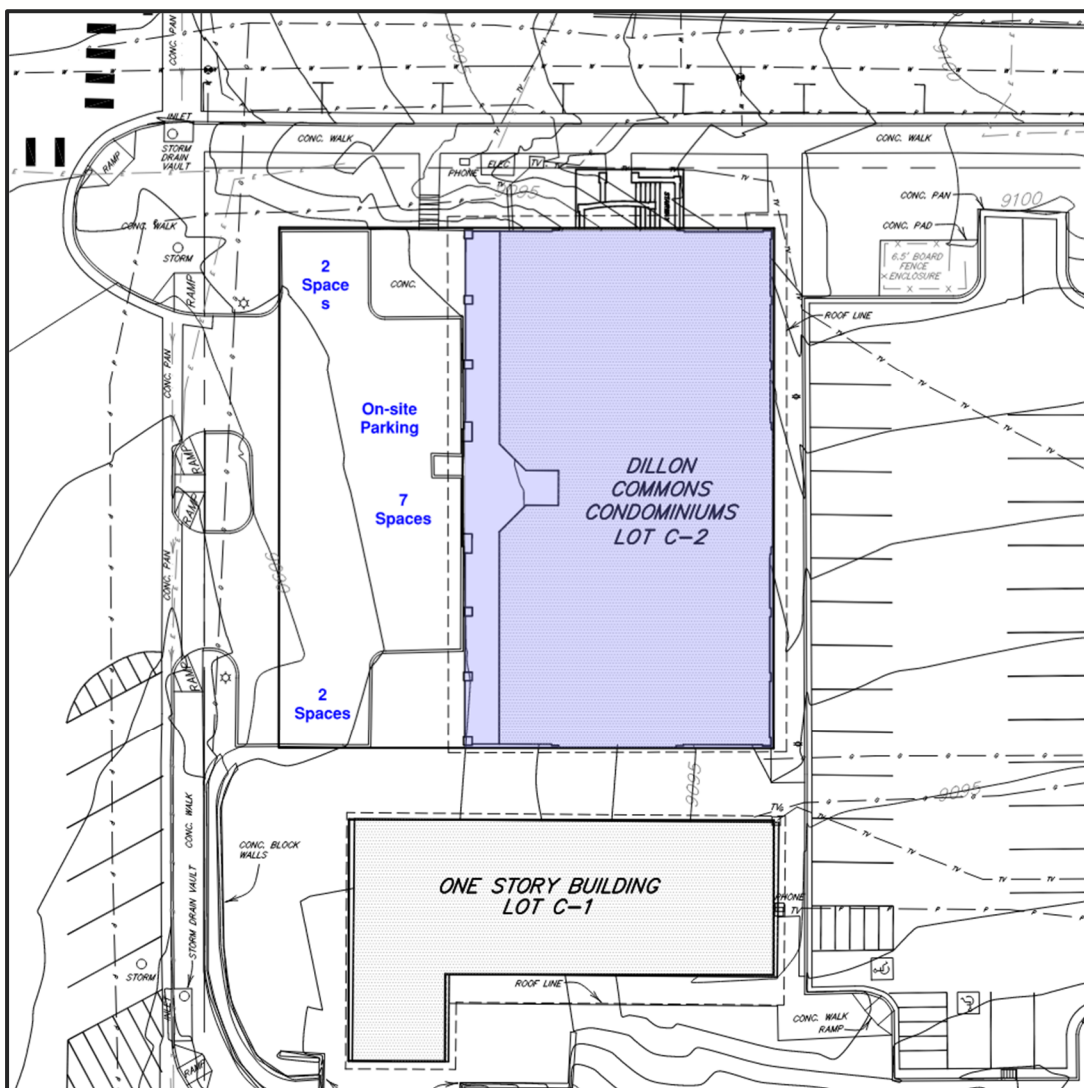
325 Lake Dillon Drive On-site & nearby parking
